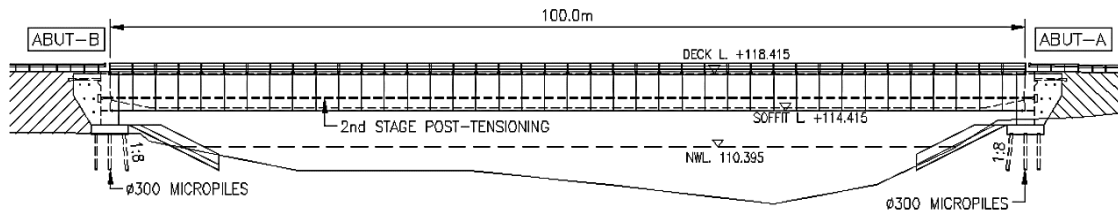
Elevation view of Batu 6 Bridge [34].
